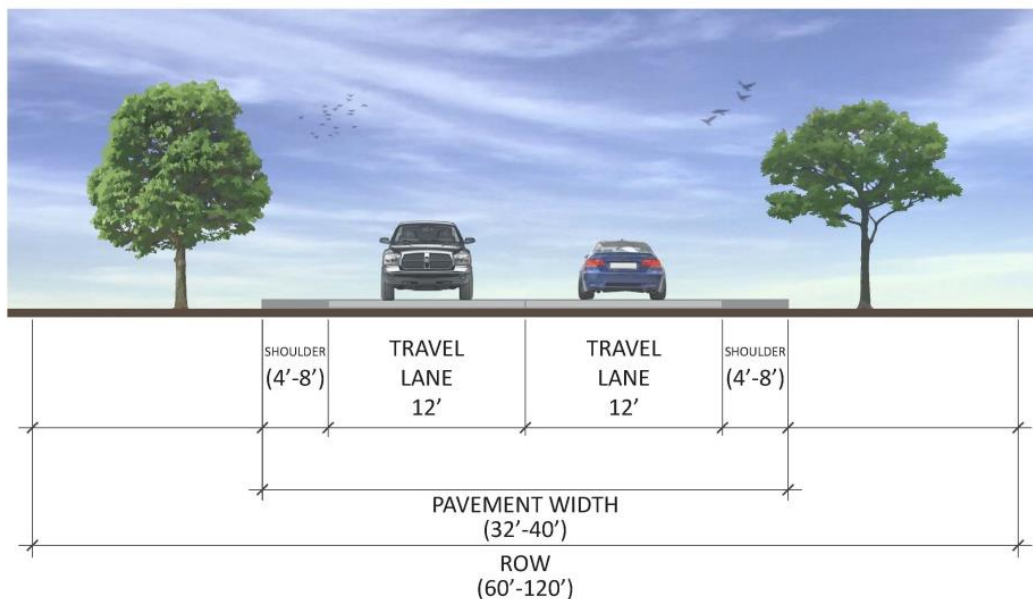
Proposed Rural Arterial Cross-Section
